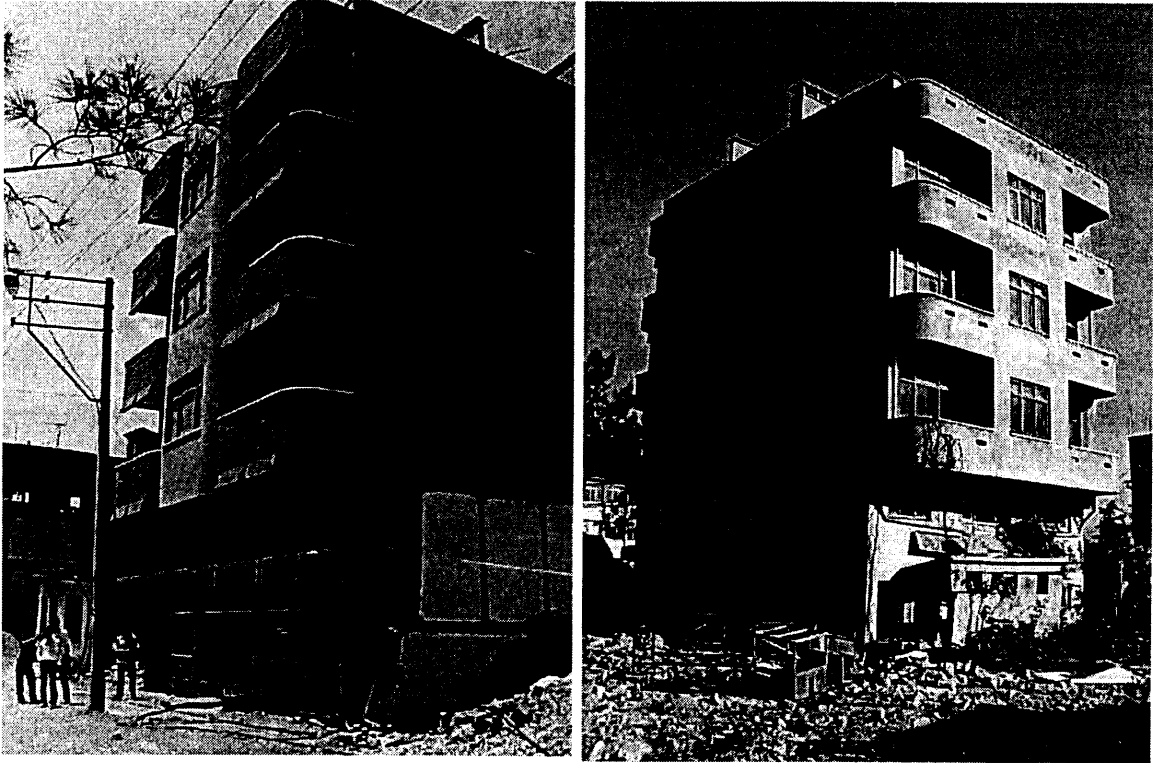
a) View from Meydan street of the north and east sides of the building b) view of the north and west sides of the structure.
